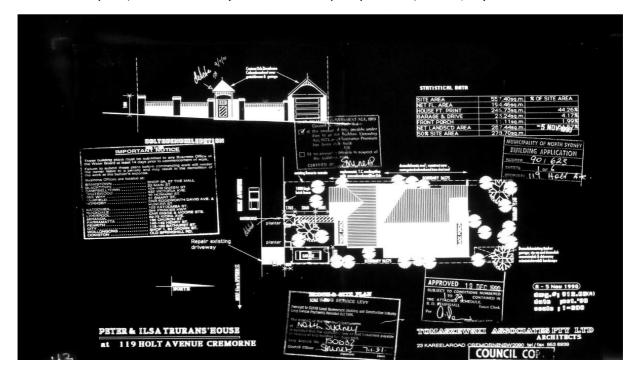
Block and site plan, Peter and Ilsa Truran's house, 119 Holt Avenue / Tomazsweki Associates Pty Ltd, October 1990. (Source: North Sydney Council, BA623/90)
